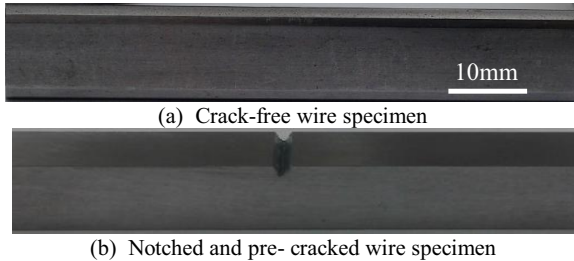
Crack-free, and notched pre-cracked laboratory wire specimens
